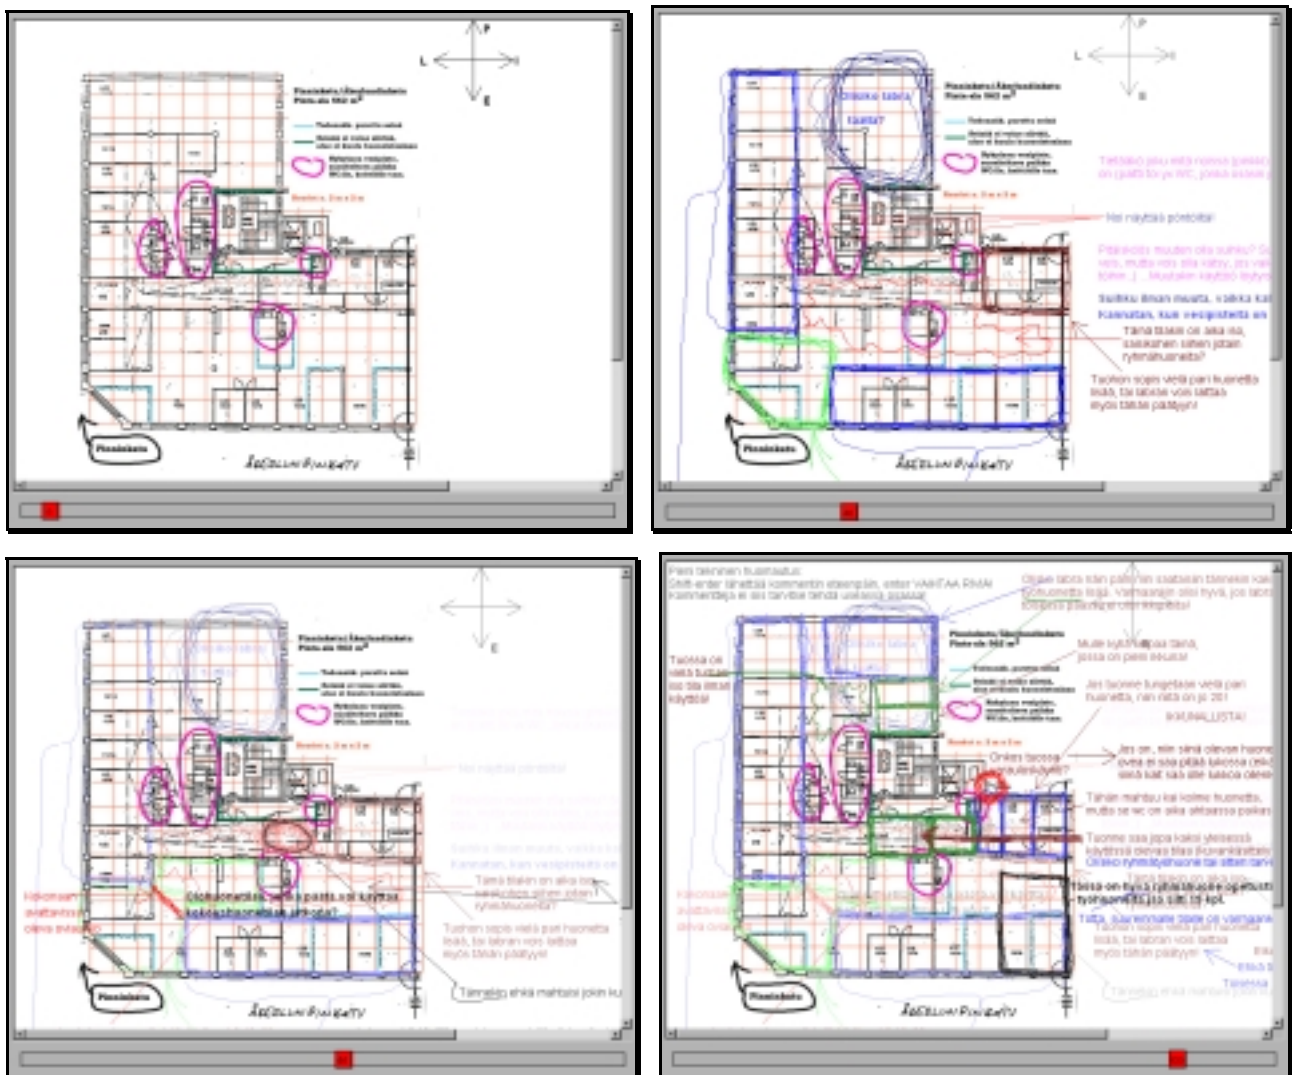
Four views on a "floor planning" discussion. The discussion started with an initial floor plan provided as a background picture.
